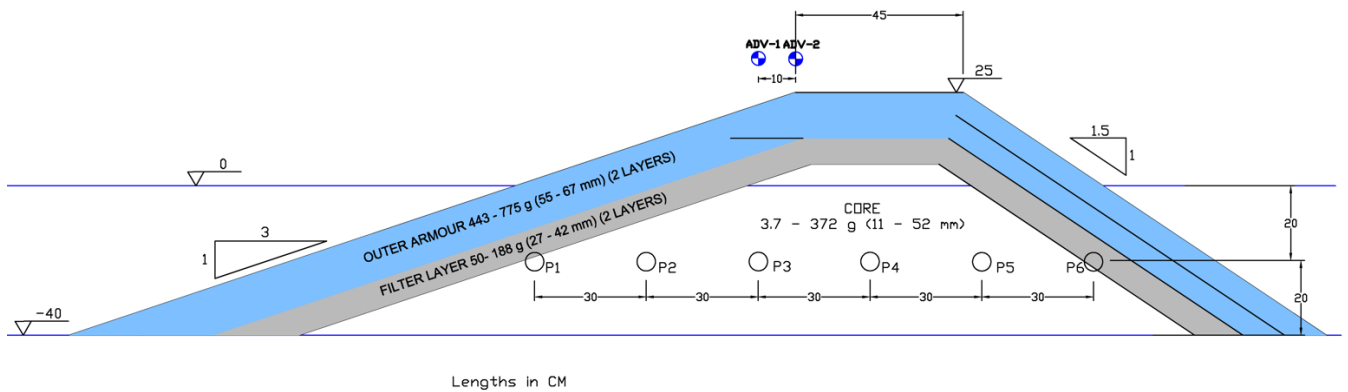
Rubble-mound breakwater without crown-wall (type II) transversal section
